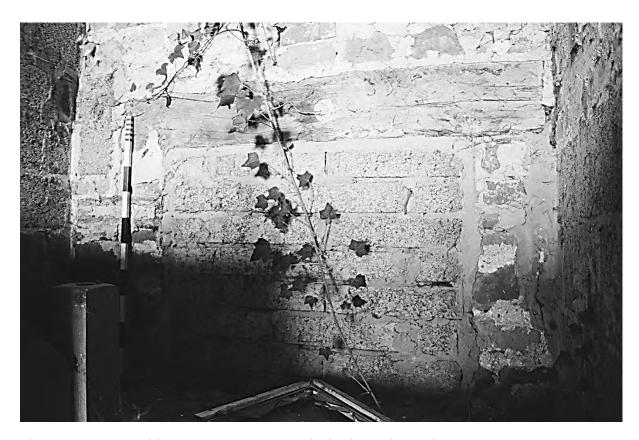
Farm Building 5. Room 5.5/5.8 Blocked Window (Film 1/14). Facing East.
